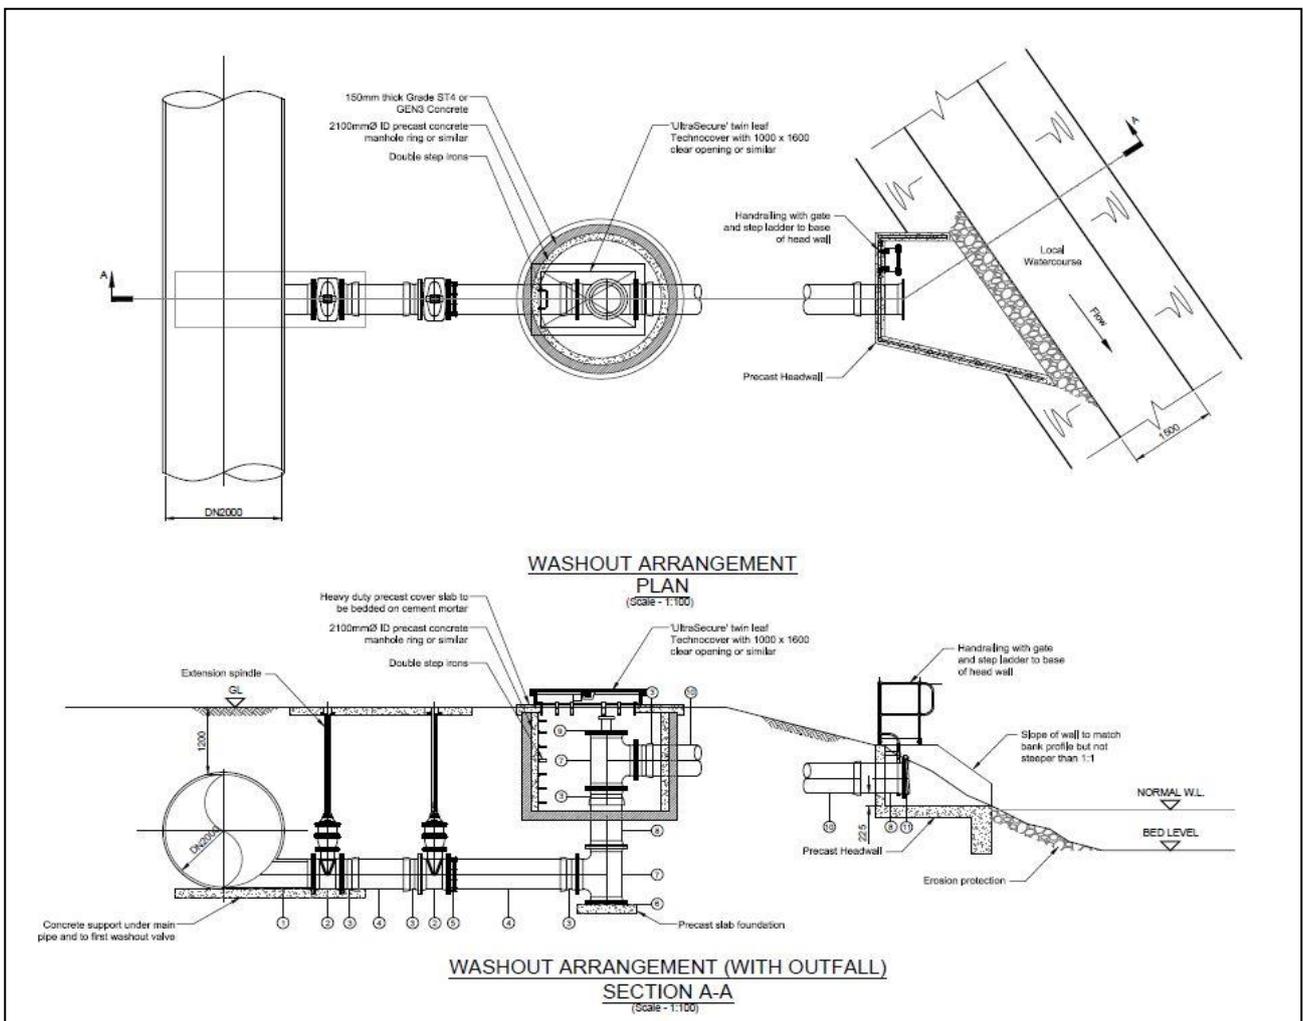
Typical Washout Valve Arrangement - with Outfall
